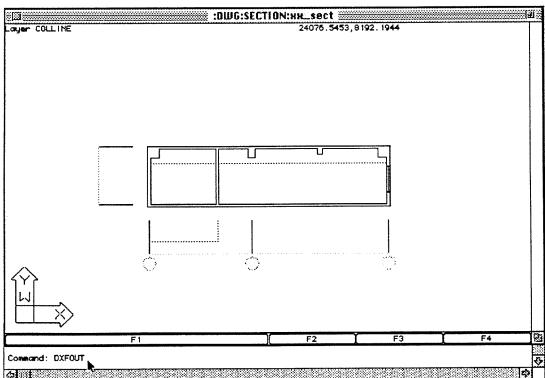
Input Drawings on AutoCAD (Plan and Section)
